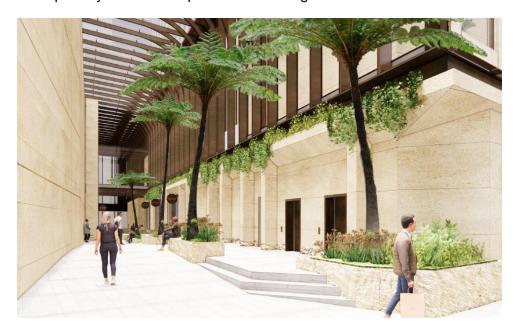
Perspective drawing of Queens Court from Dalley Street. Ramped vehicle access must be provided to service the Ausgrid site to the left of the image.
